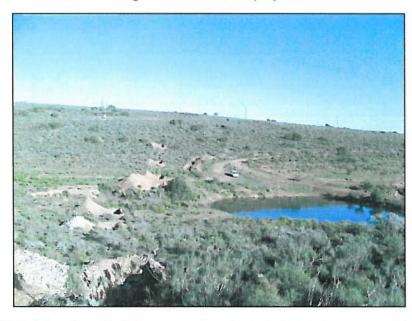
Existing dam. Earth heaps mark geotechnical trials for proposed dam wall
